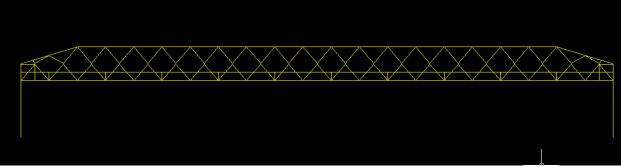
Side view of bridge with the truss sitting on top of the decking support.
